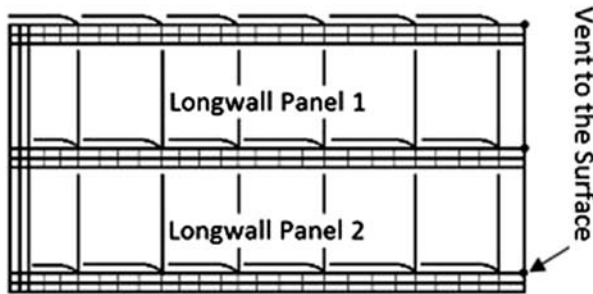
Ventilation layout for a longwall panel in mildly gassy coal seams.
